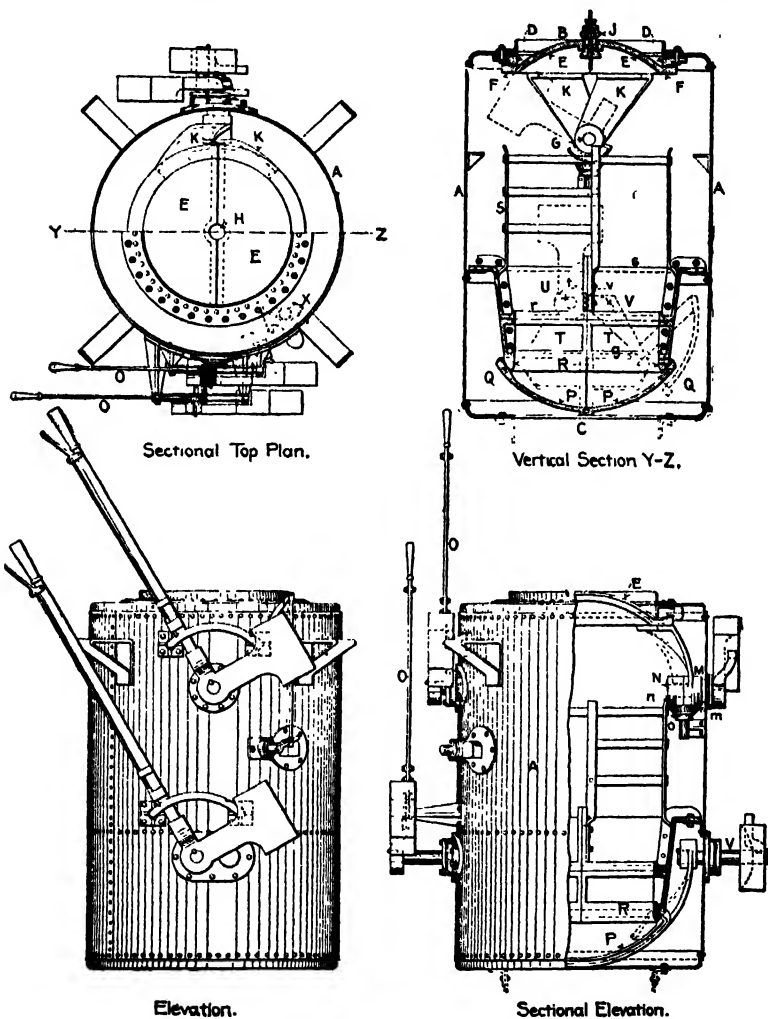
Details of Construction of O'Rourke Air-Lock.
